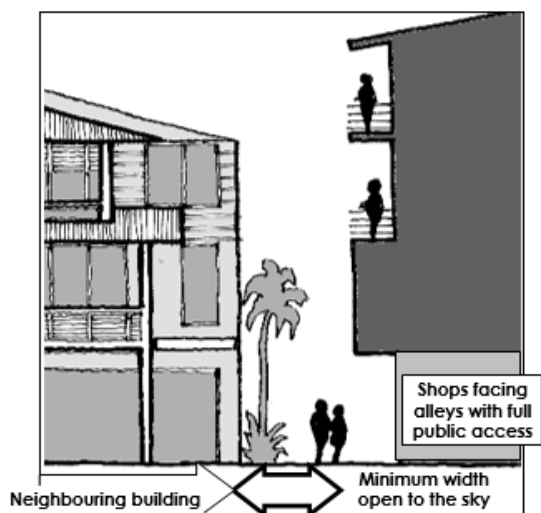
Accessible alleyways. Viewed from the street frontage
